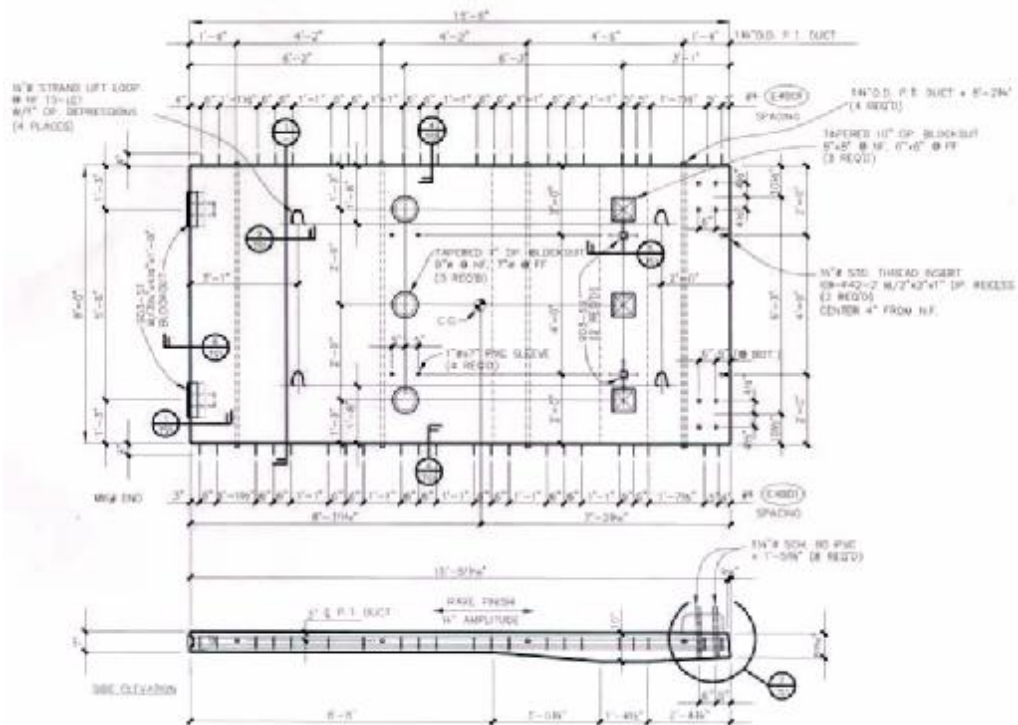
Details of interior panels of a typical 50-ft bay
